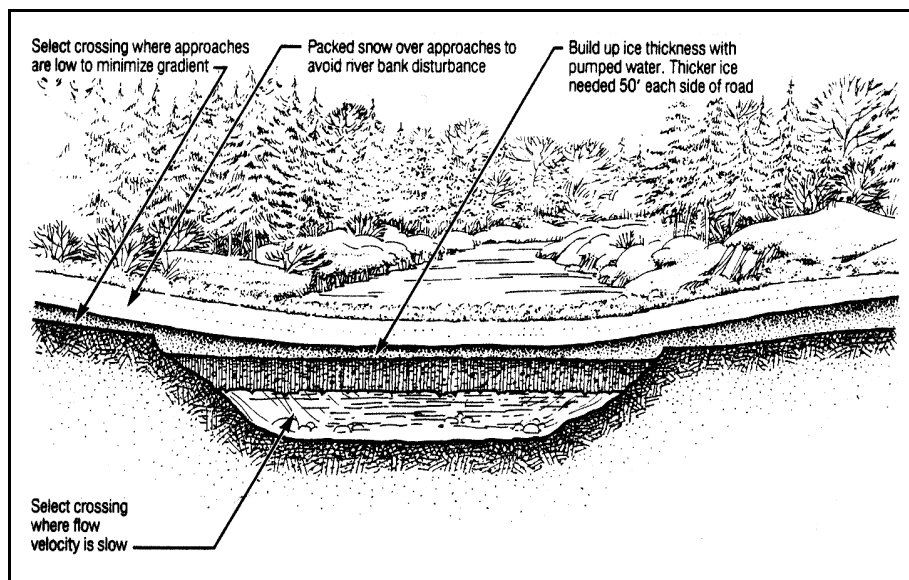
Details of ice bridge construction for temporary stream crossing in winter (Ontario MNR, 1990).
